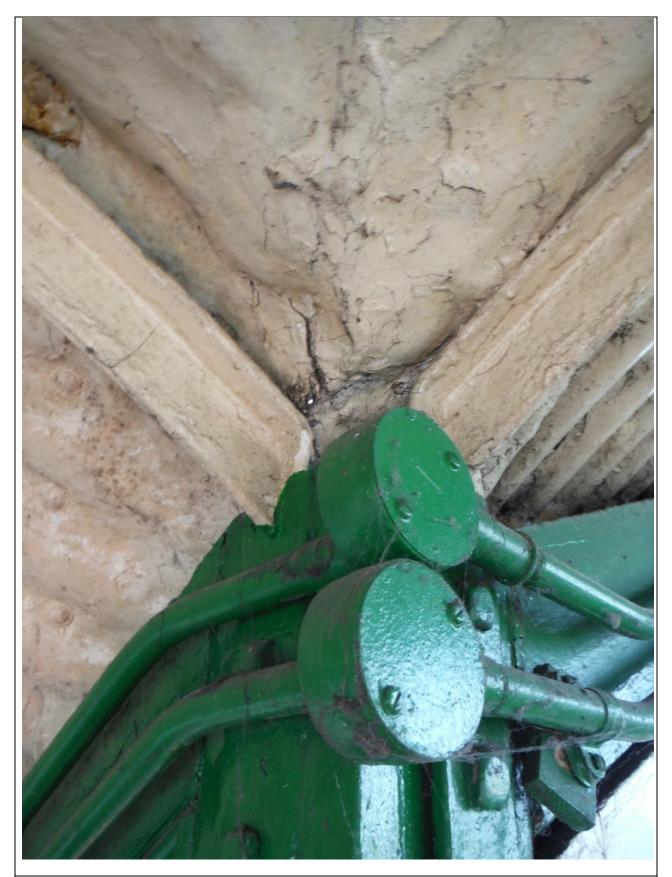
Split in corrugated roof cladding at stair landing, causing leak into footbridge and water ingress at westernmost corner (Platform 2)
